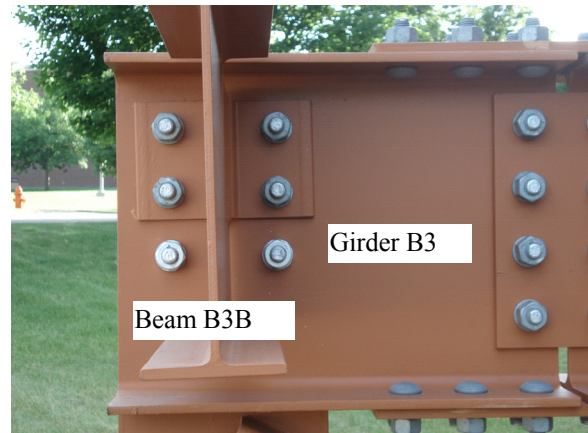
View C Double bolted-welded-angle shear connection, back of View B
